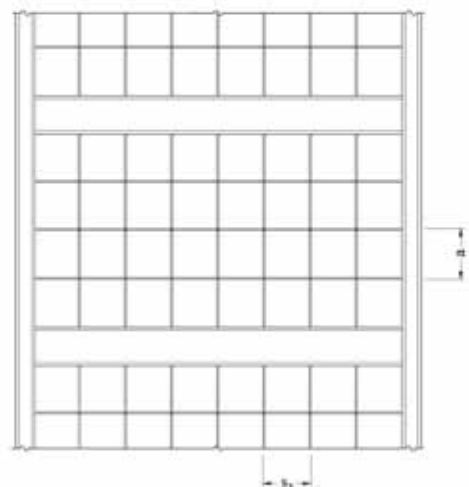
Steel plate shear wall with vertical and horizontal stiffeners.
